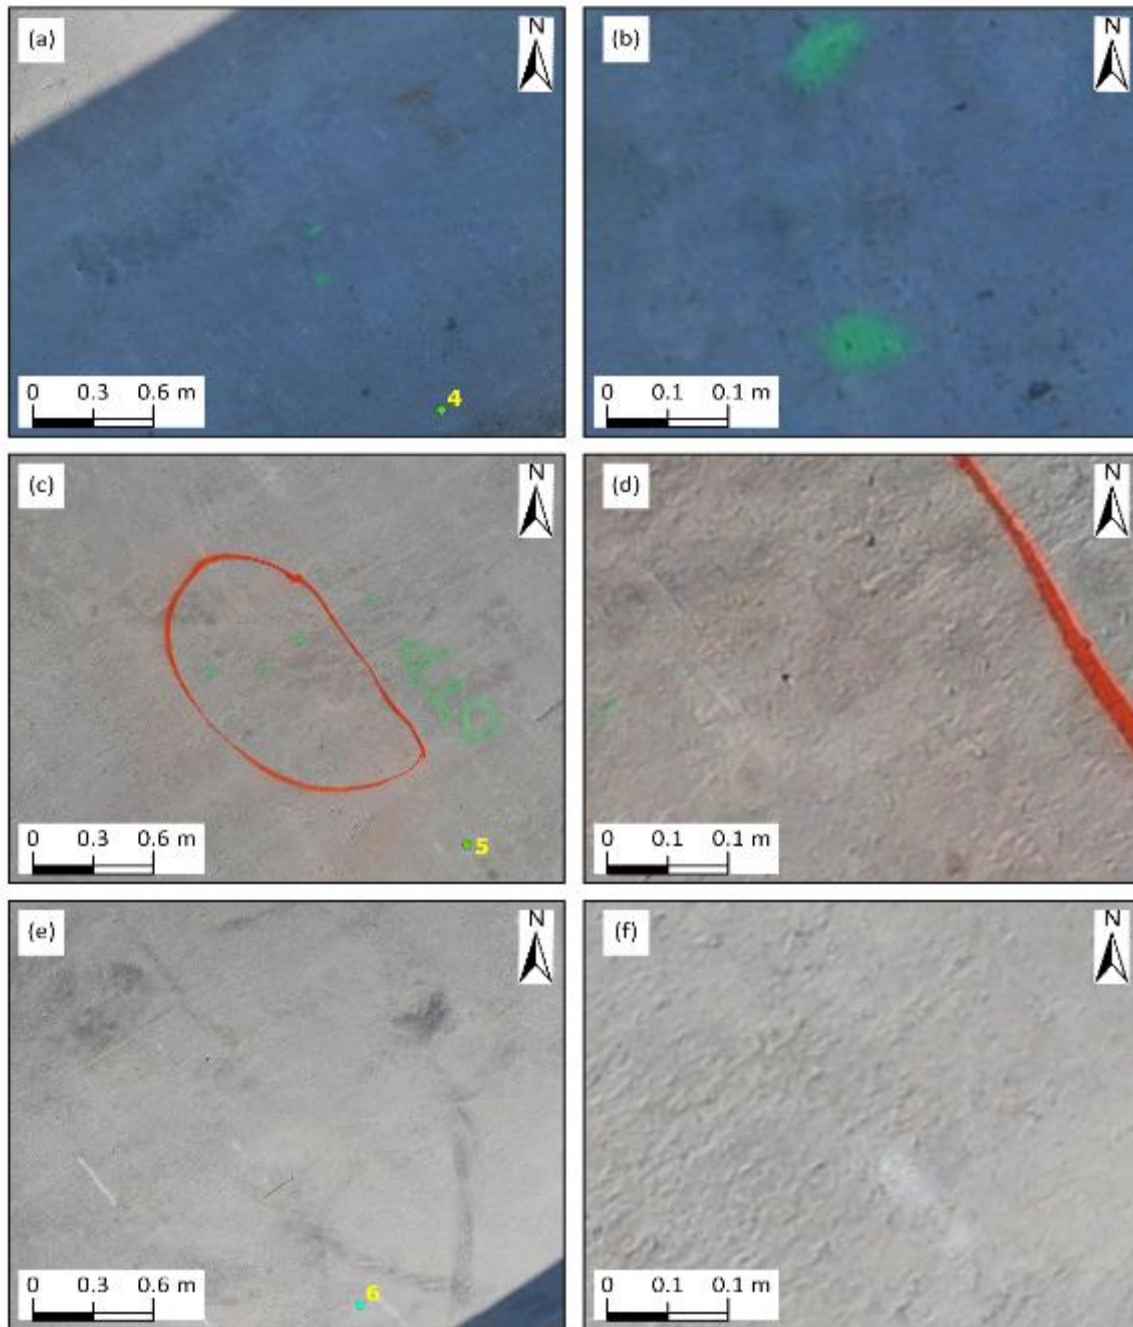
Cracks 4 through 6 at 0.035 in. (0.88 mm) GSD (1:30 zoom level on left and 1:5 zoom level on right)
